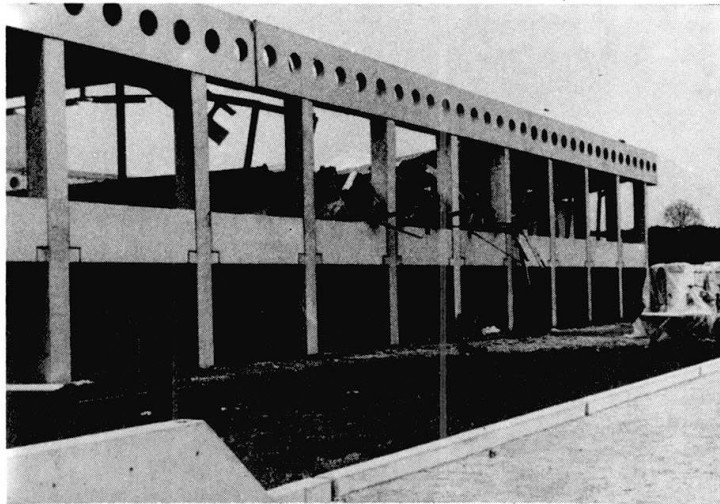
Heavily damaged prefabricated factory shed near Osoppo with roof girders fallen down. Friction joints insufficient to provide structural stability.
